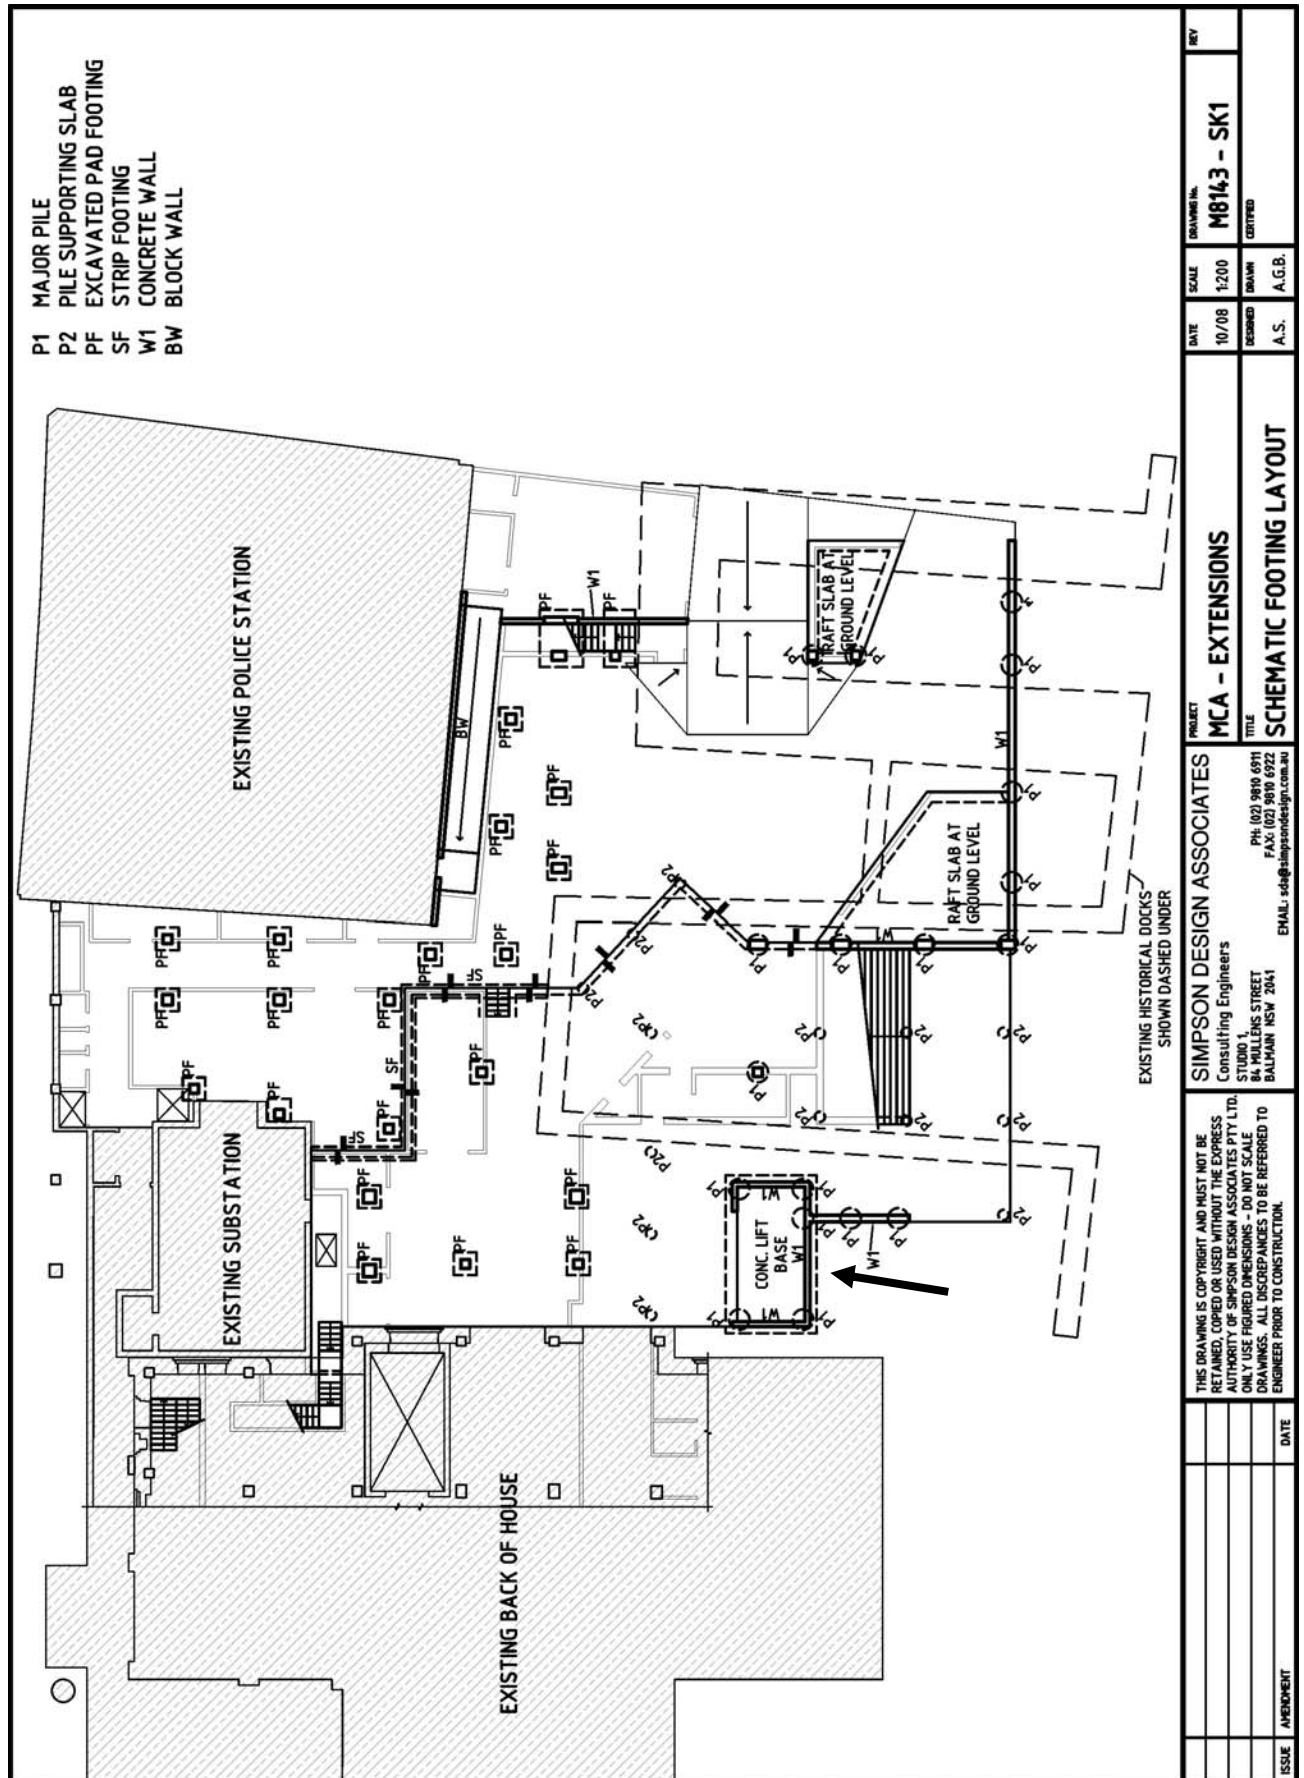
Plan showing indicative pile and pad footing locations in relation to the docks. The proposed lift pit is arrowed.
